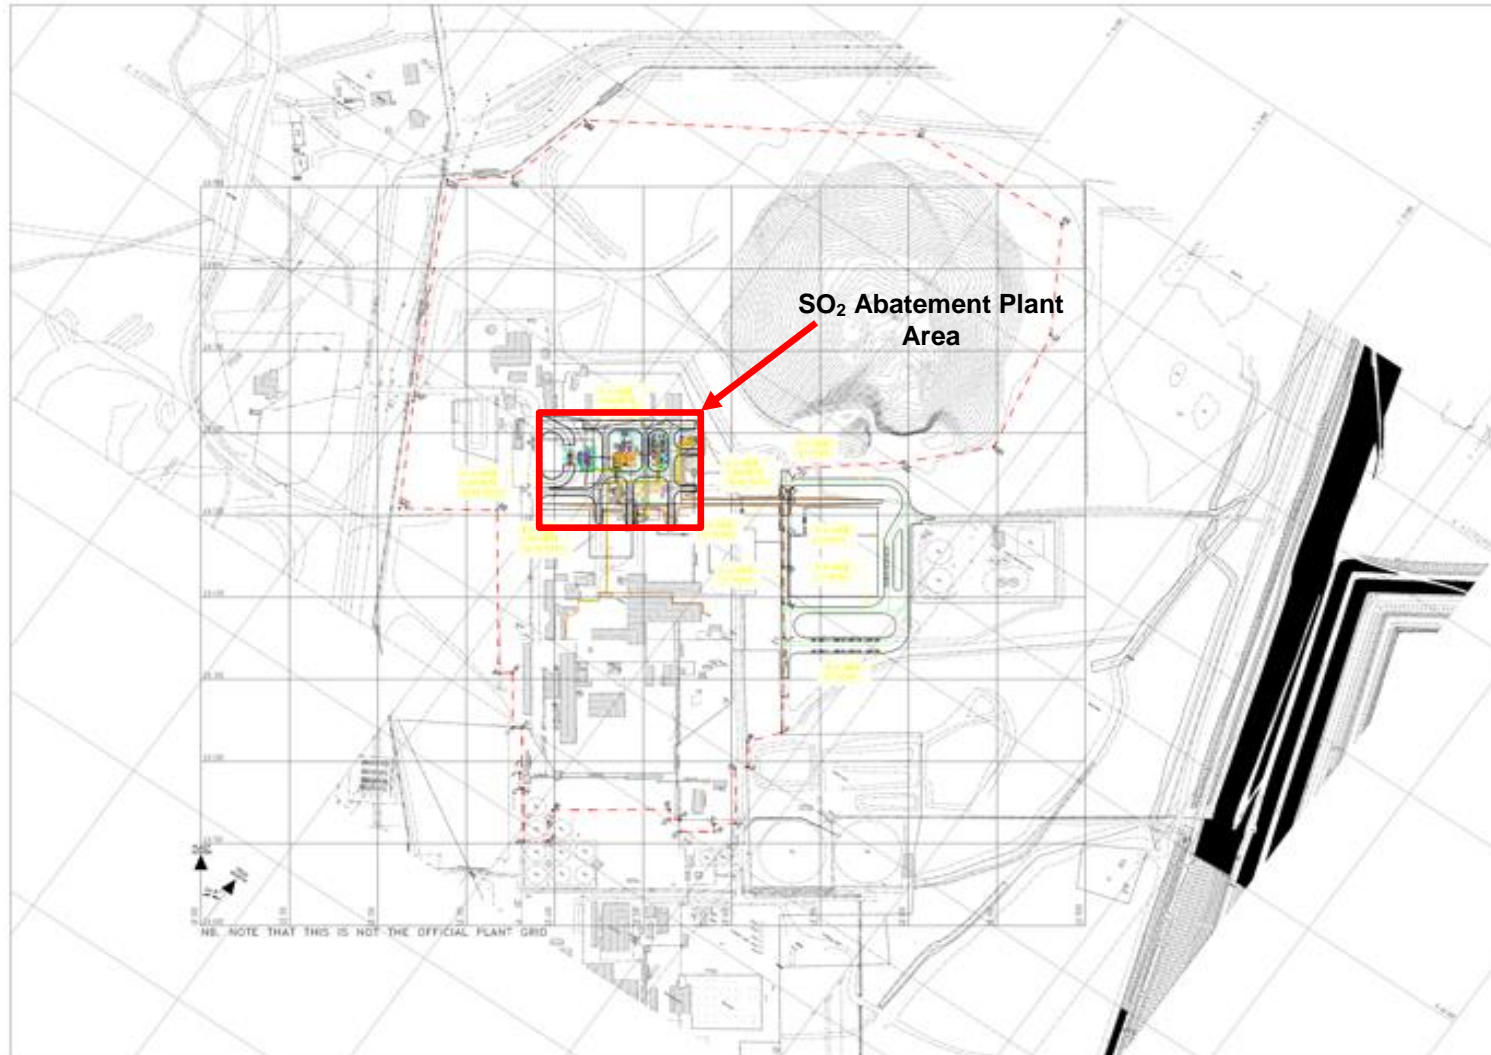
Plan layout of SO<sub>2</sub> abatement plant
